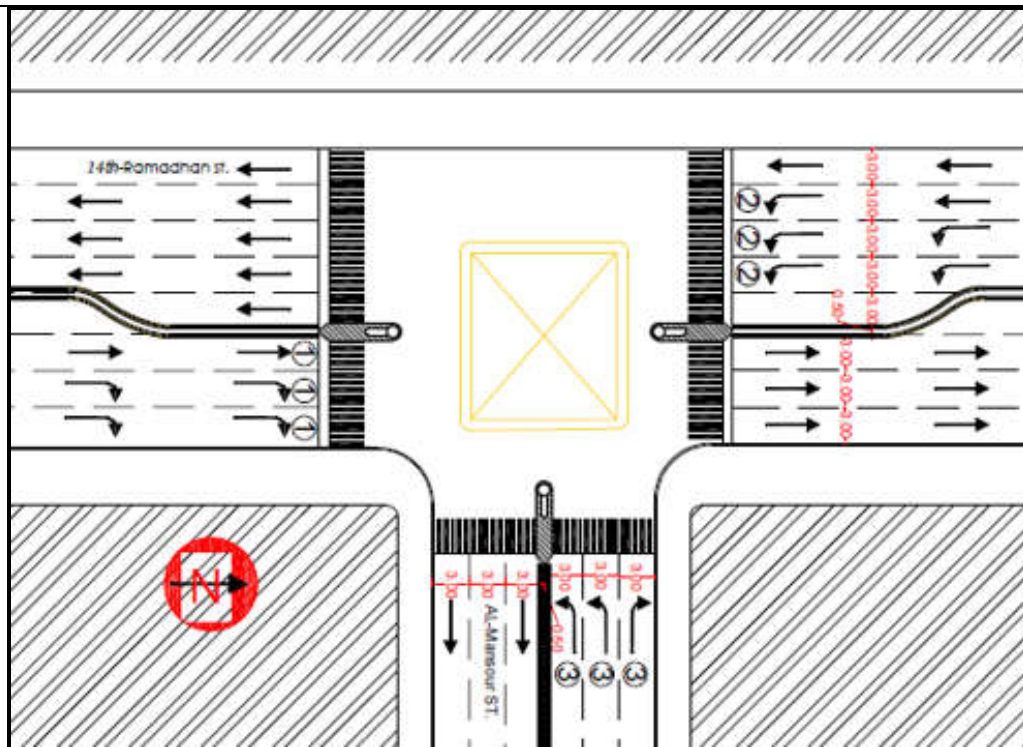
Geometric Layout of Existing LOS and First Proposal
